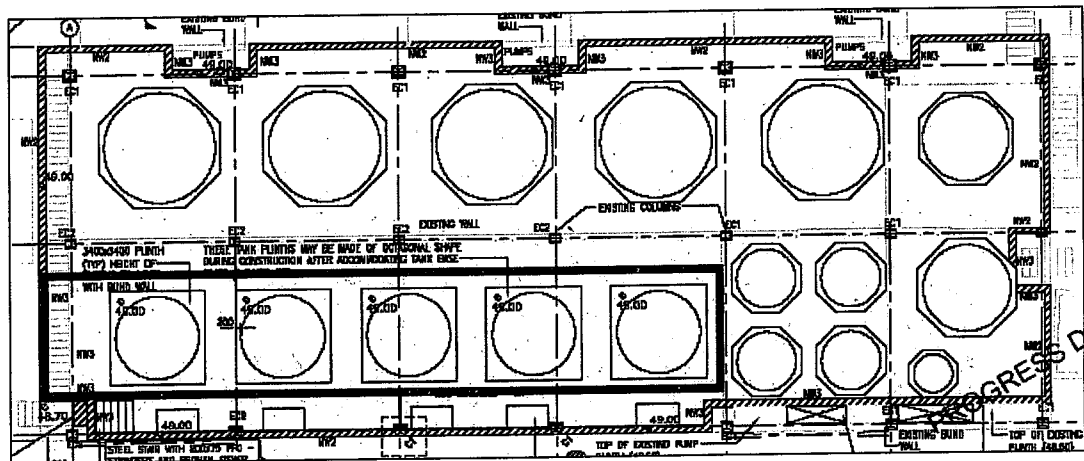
Location of 5 no. new stainless steel waste solvent storage tanks in bund (outlined in red)
